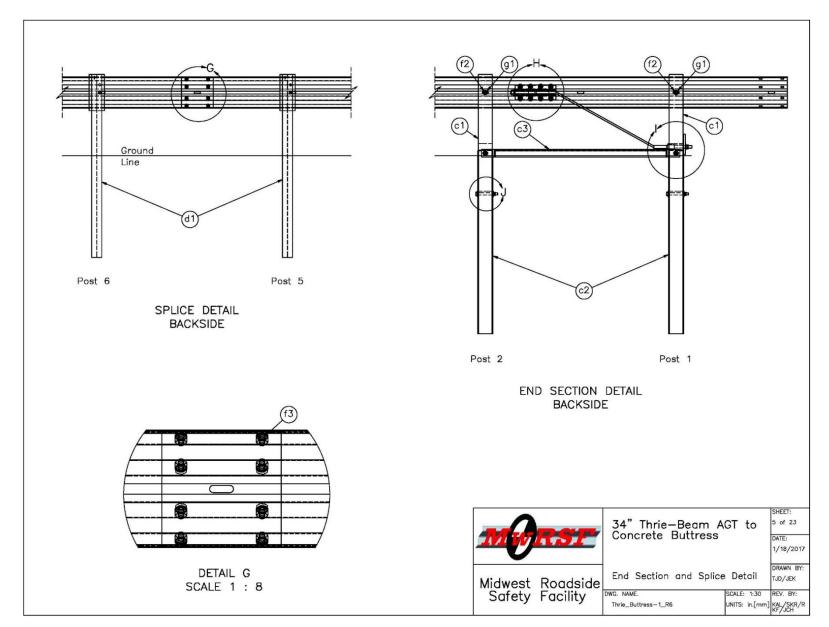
End Section and Splice Detail, Test Nos. 34AGT-1 and 34AGT-2
